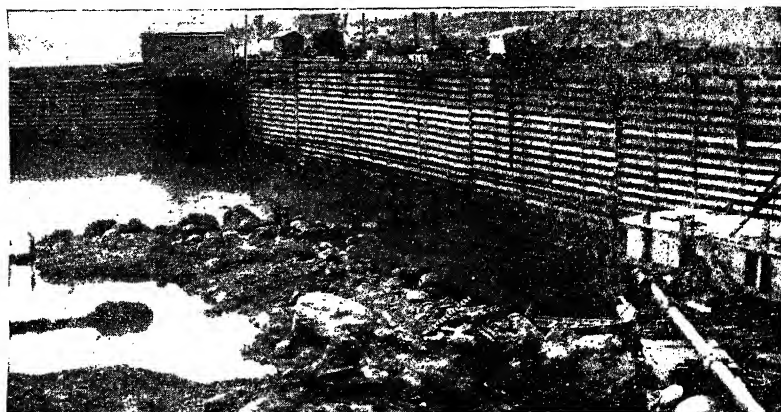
Inside-rock-filled crib cofferdam at Bonneville Dam.
